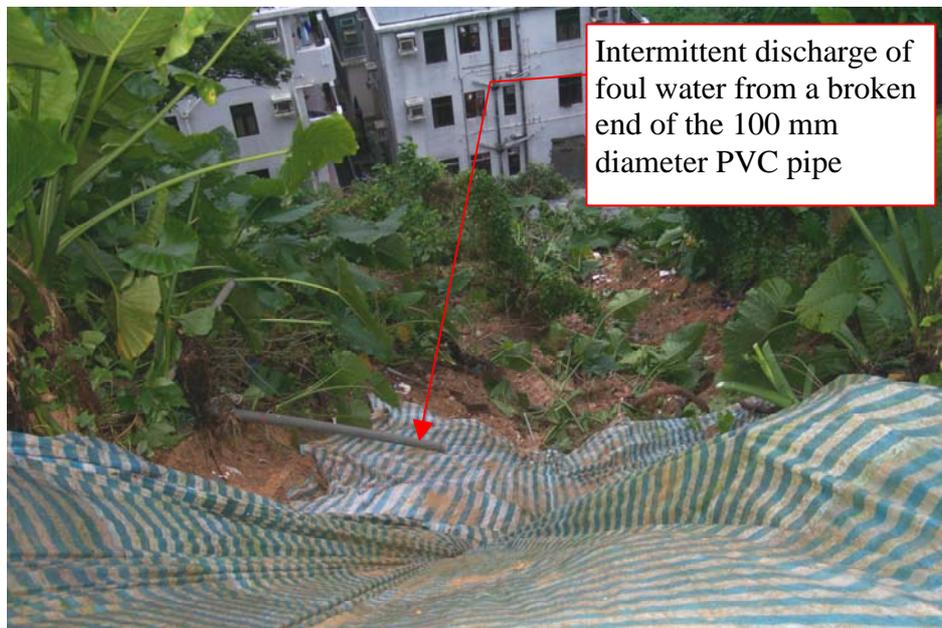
View of the 100 mm Diameter PVC Pipe at the Landslide Site (Photograph taken on 3 September 2001)
